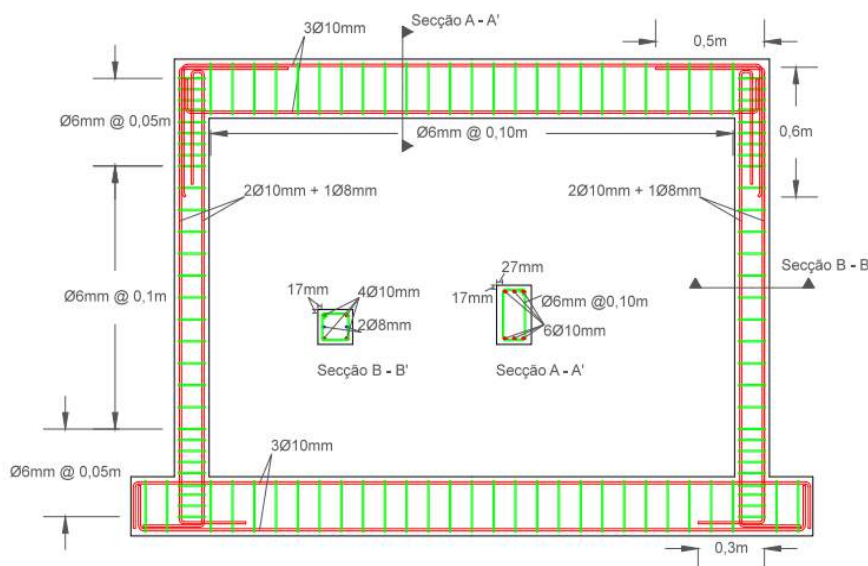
Design of the reinforced concrete frame for experimental tests.
